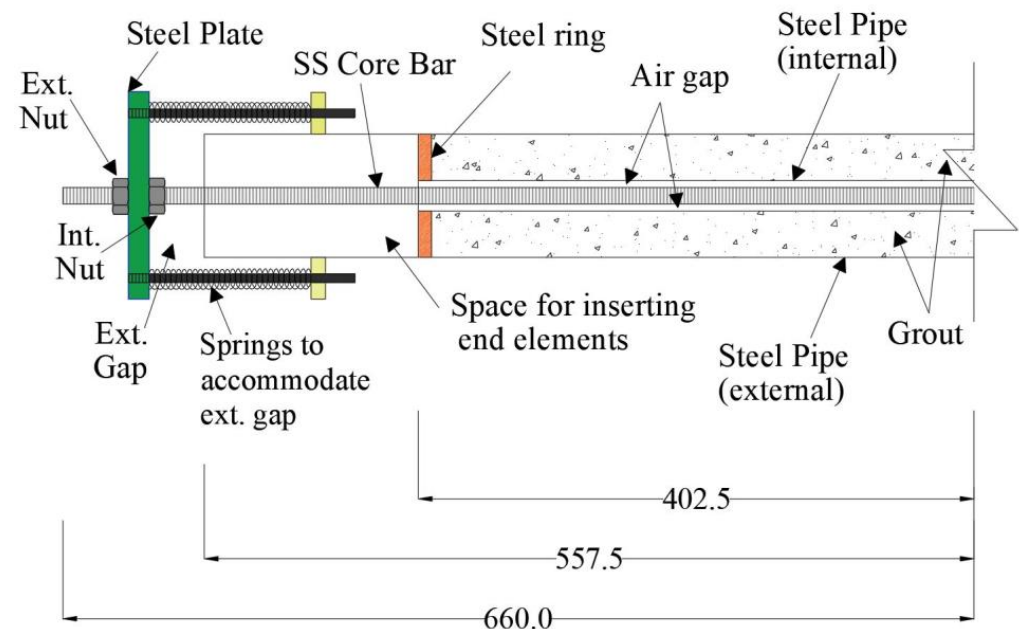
Schematic layout of the introduced BRB (half side, dimensions are in mm).
